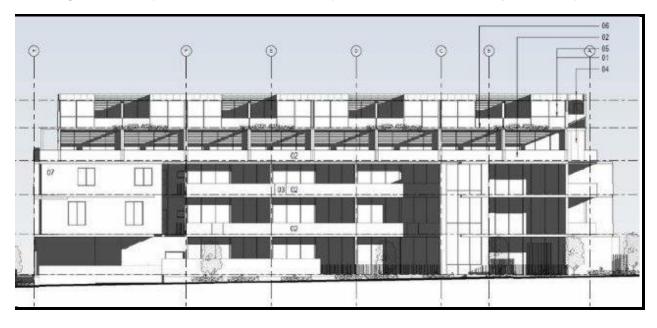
Proposed Eastern Elevation (Source: Brewster Murray, 13/10/2017)
